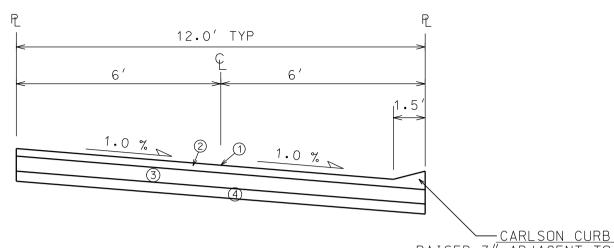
DETAIL - HAND FORMED CONCRETE ALLEY CURB AND GUTTER @ BUILDING FACE
